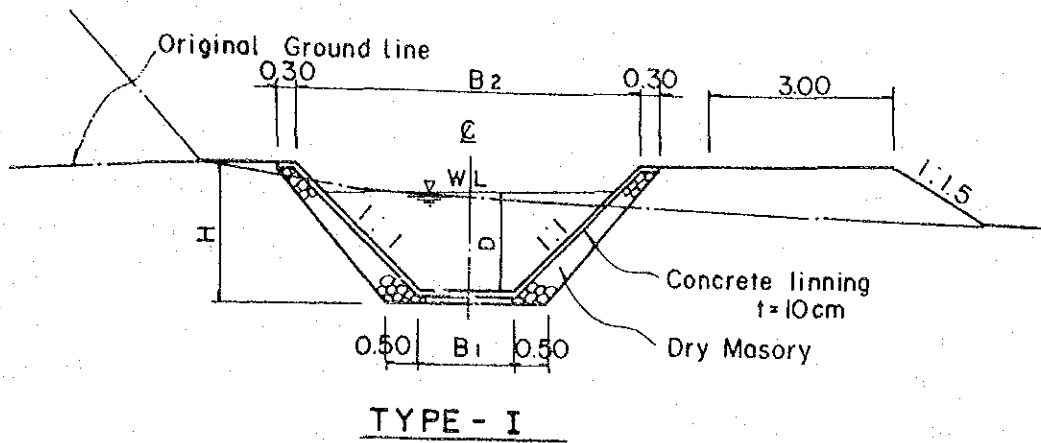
TYPICAL CROSS SECTION OF CANAL
